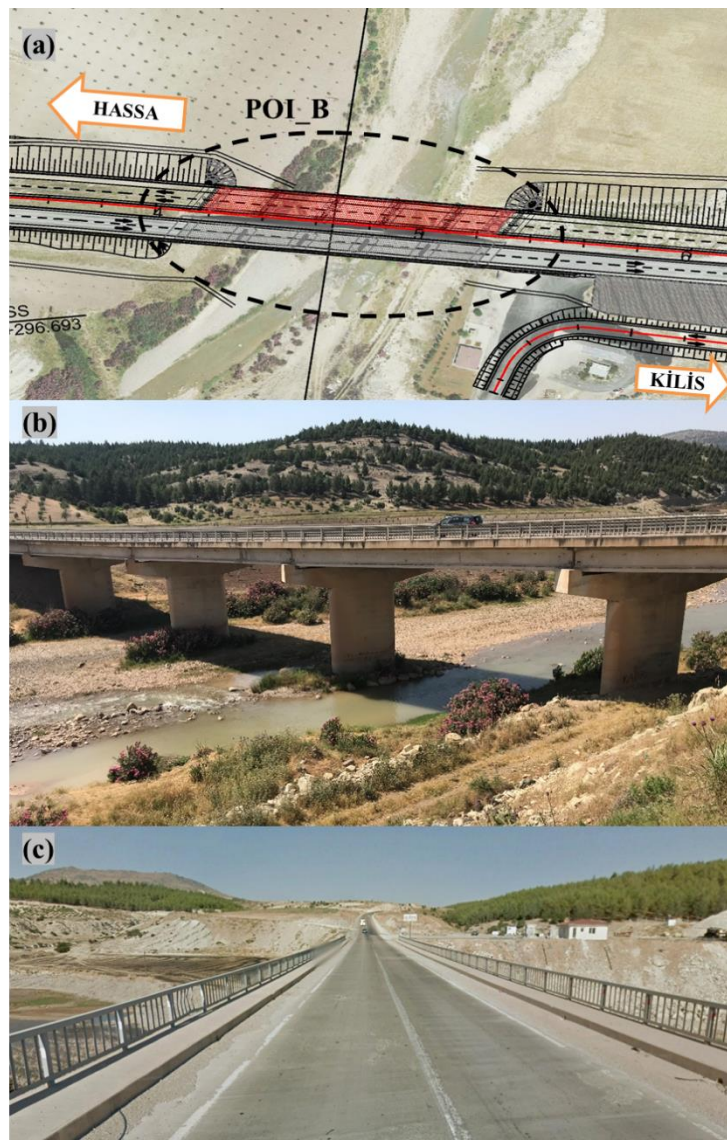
Afrin Bridge (a) POI_B on plan view (b) existing bridge (c) a view of the existing bridge platform
